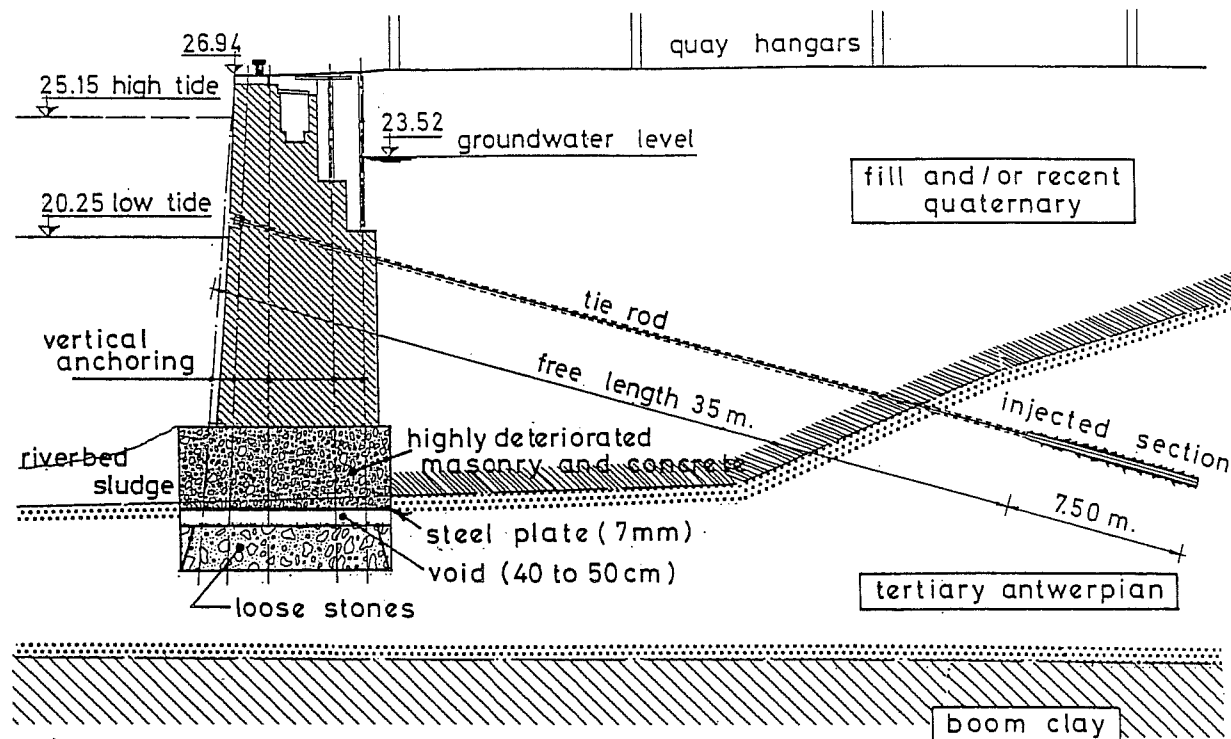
Quay wall protection : Ground anchors and strenghtening of the inner structure
